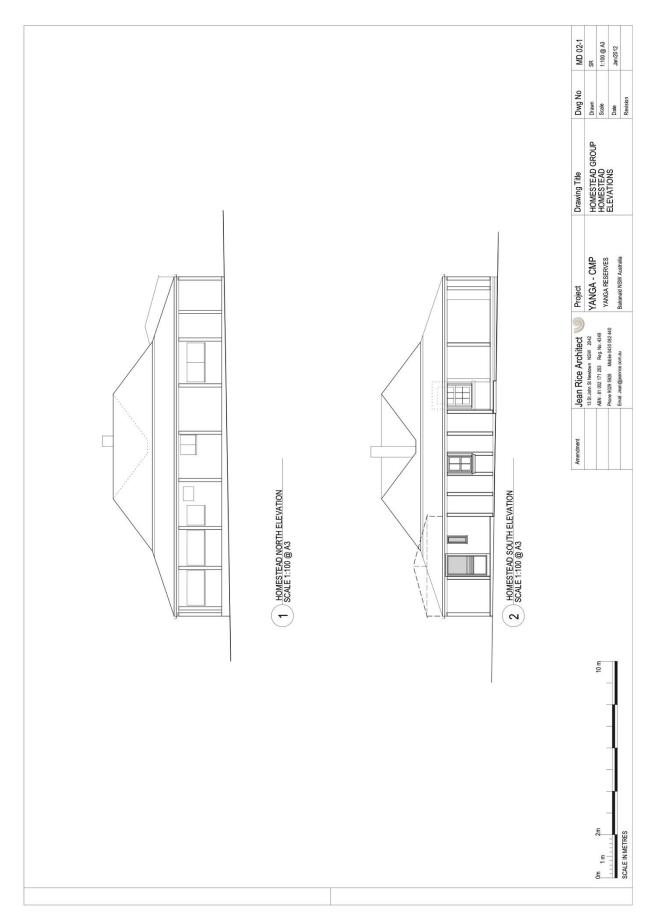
Homestead Group Main Building Elevations. Jean Rice Architect, site assessment 2009.
